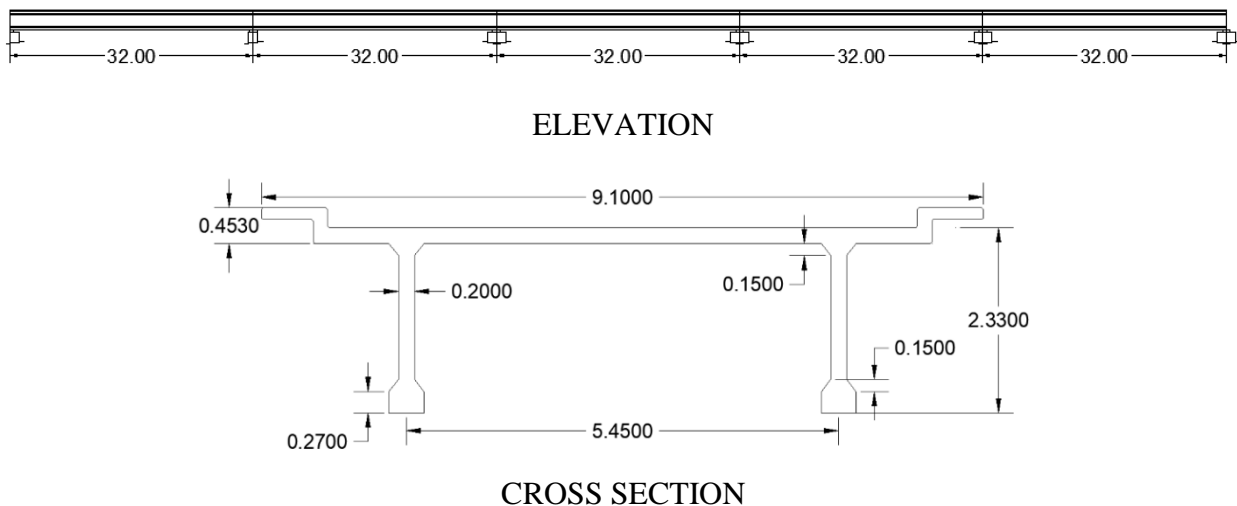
"El Gavilán" bridge superstructure geometry (Dimension m).
